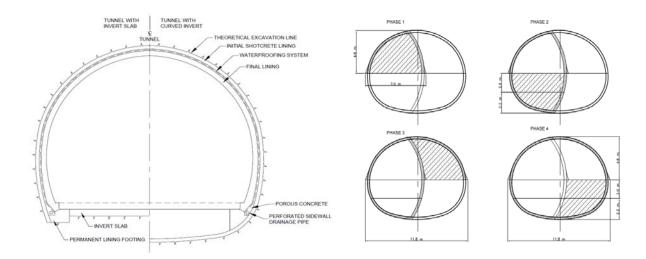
EXHIBIT B Typical SEM Tunnel Section and Excavation Sequence
